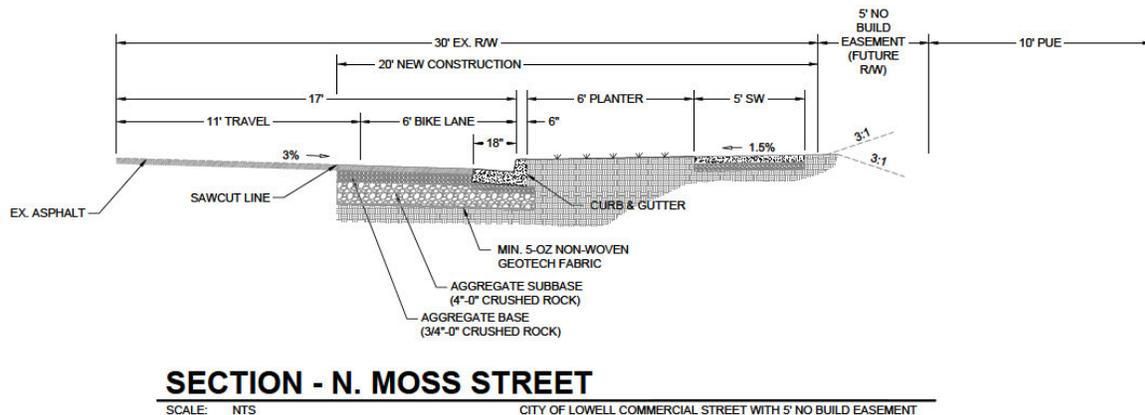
Applicant proposed frontage improvements along North Moss Street.
